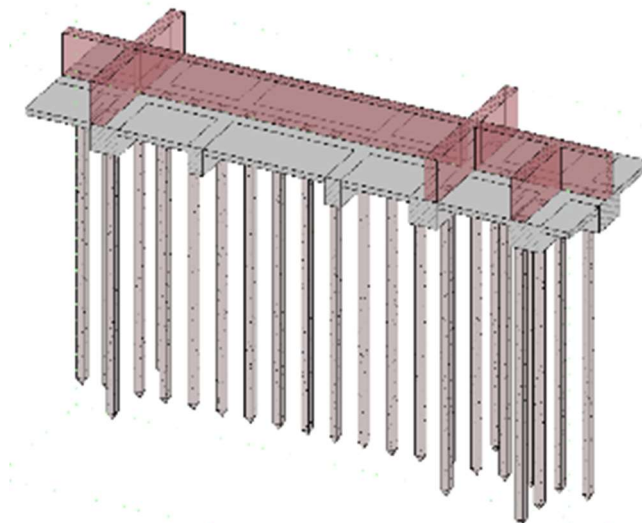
View fragment of 3D foundation scheme after strengthening (along the inner longitudinal bearing wall)
